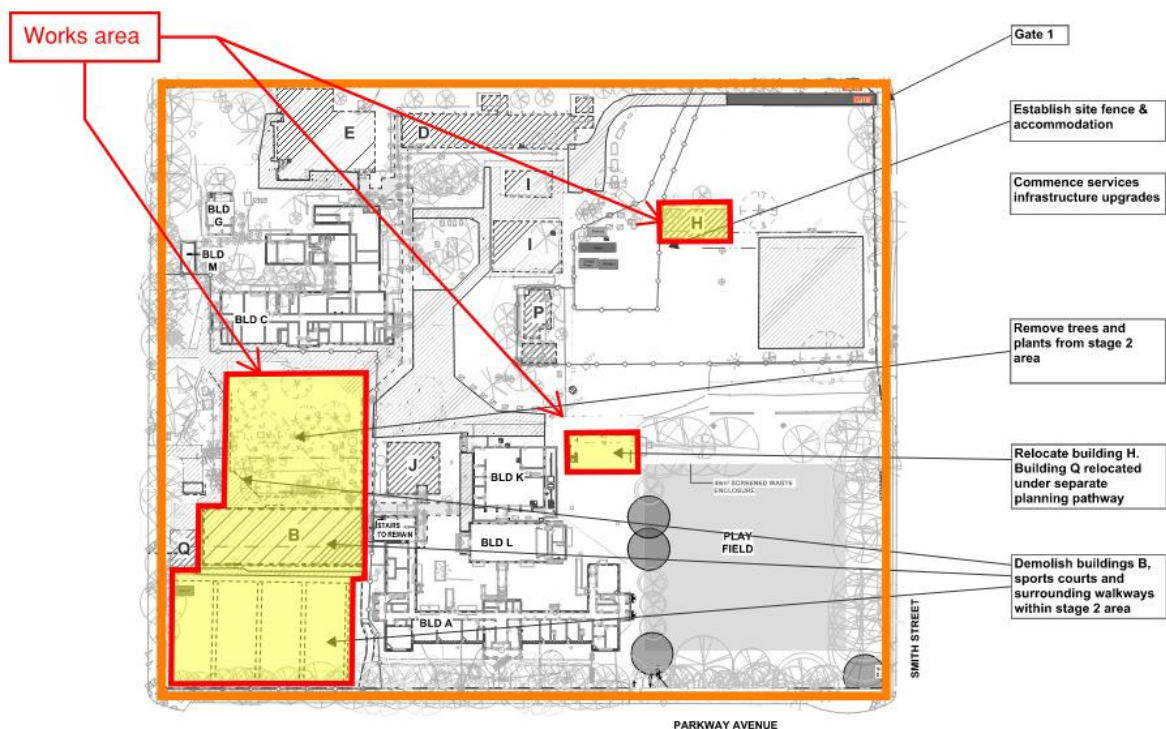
Stage 1 – Indicative site plan with site boundary plus works area highlighted.
